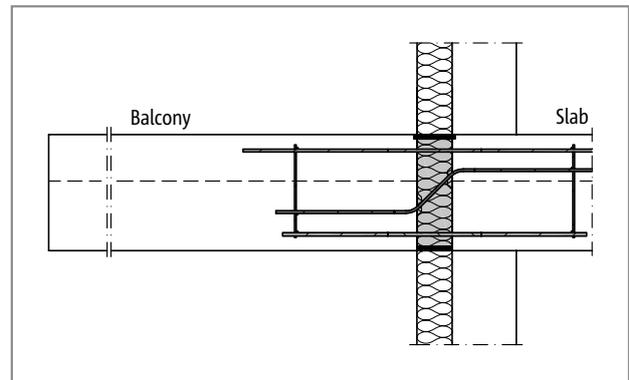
Schöck Isokorb® XT type B: Balcony construction with freely cantilevered downstand beams
